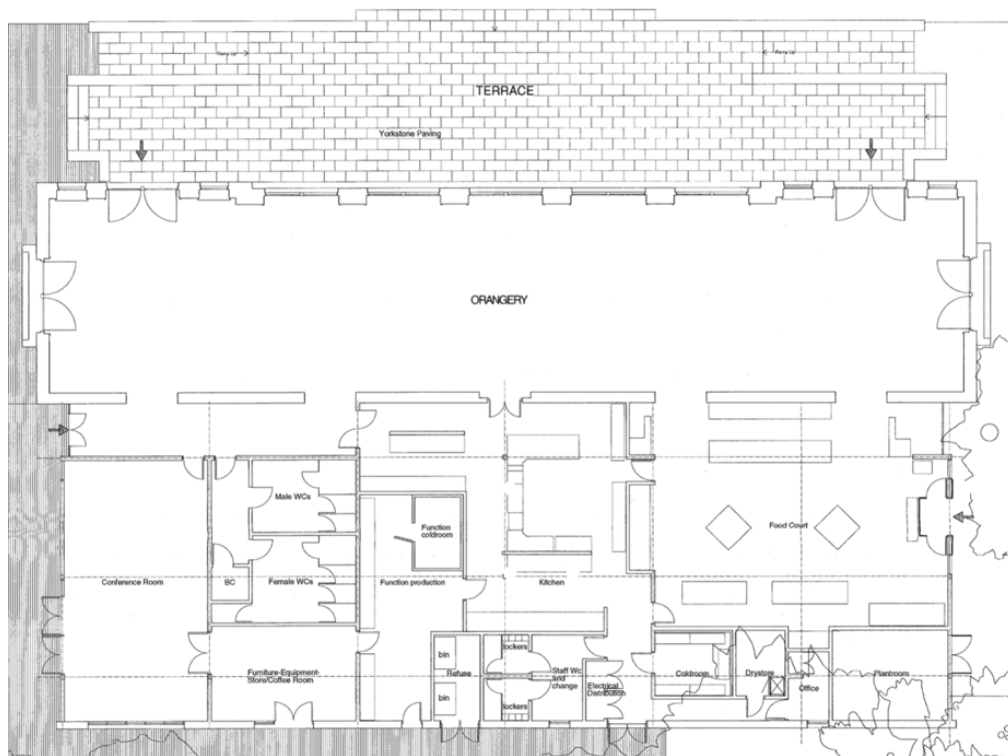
Ground Floor Plan as Proposed, Dannatt Johnson Architects dated 2001
